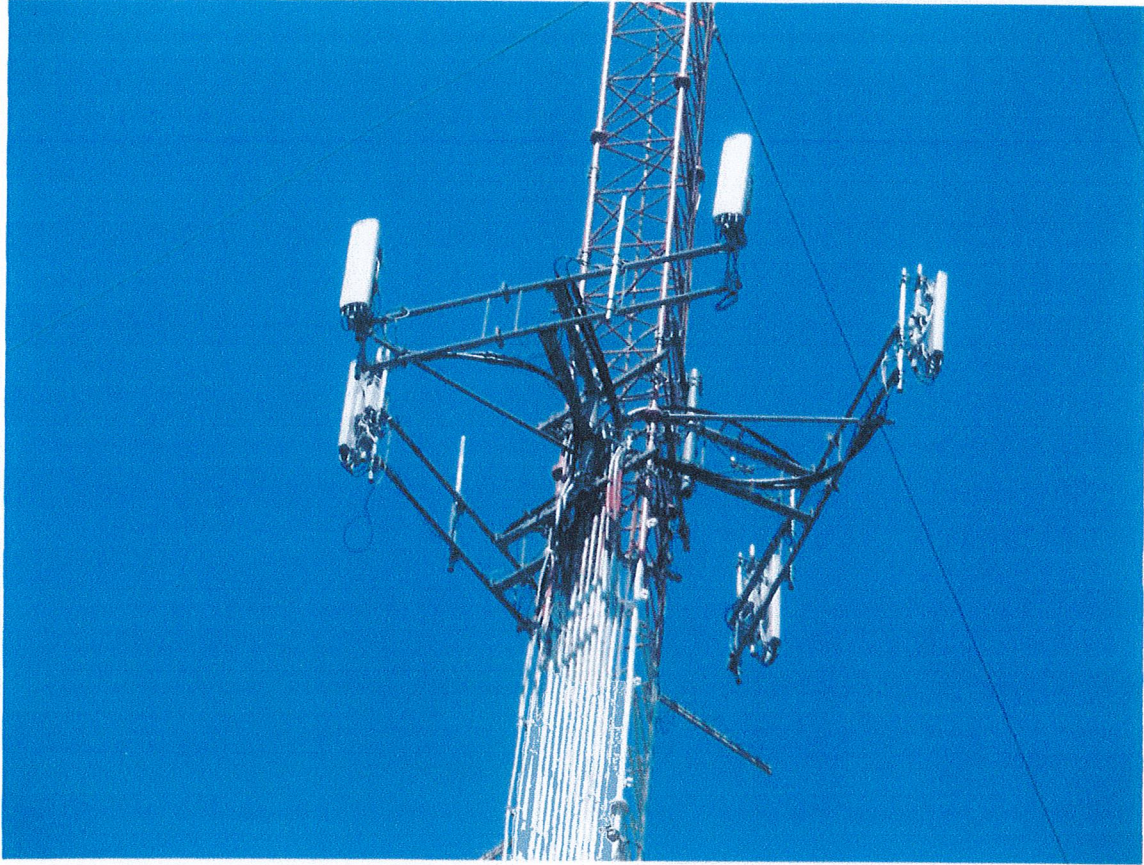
Photo illustrating the Tower with Appurtenances shown.
